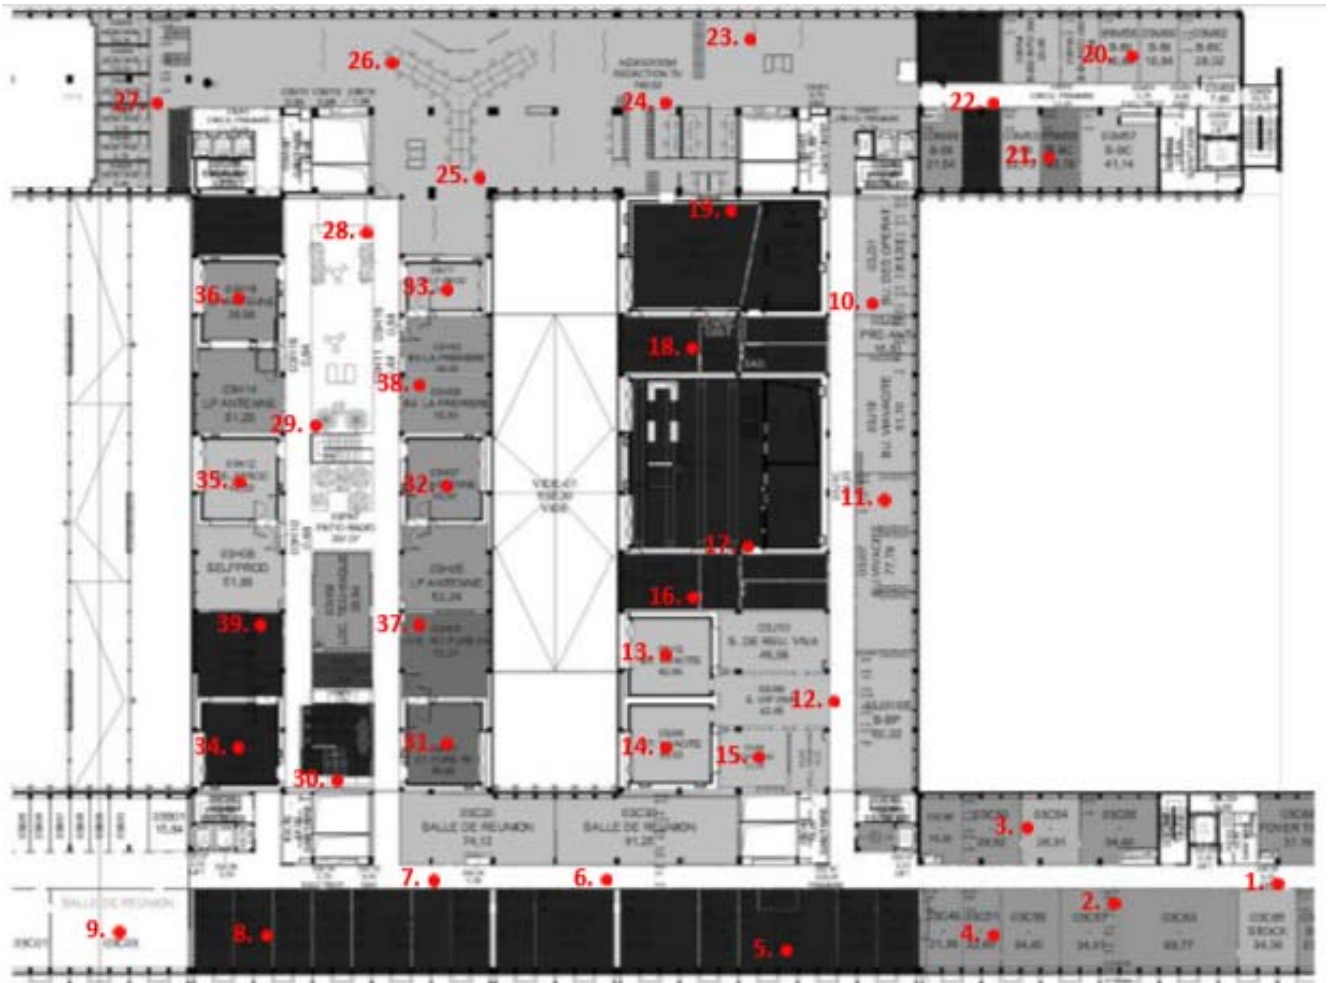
Placement Access Points for Floor 3 in Building PUVQ
